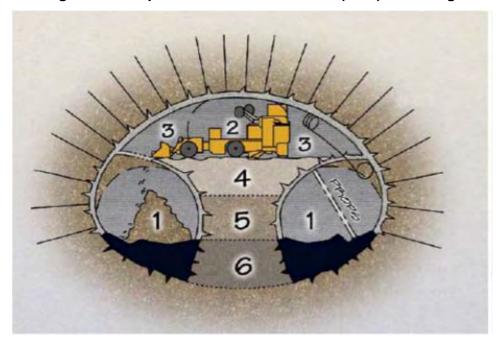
Sequential Excavation Method (SEM) Tunneling
